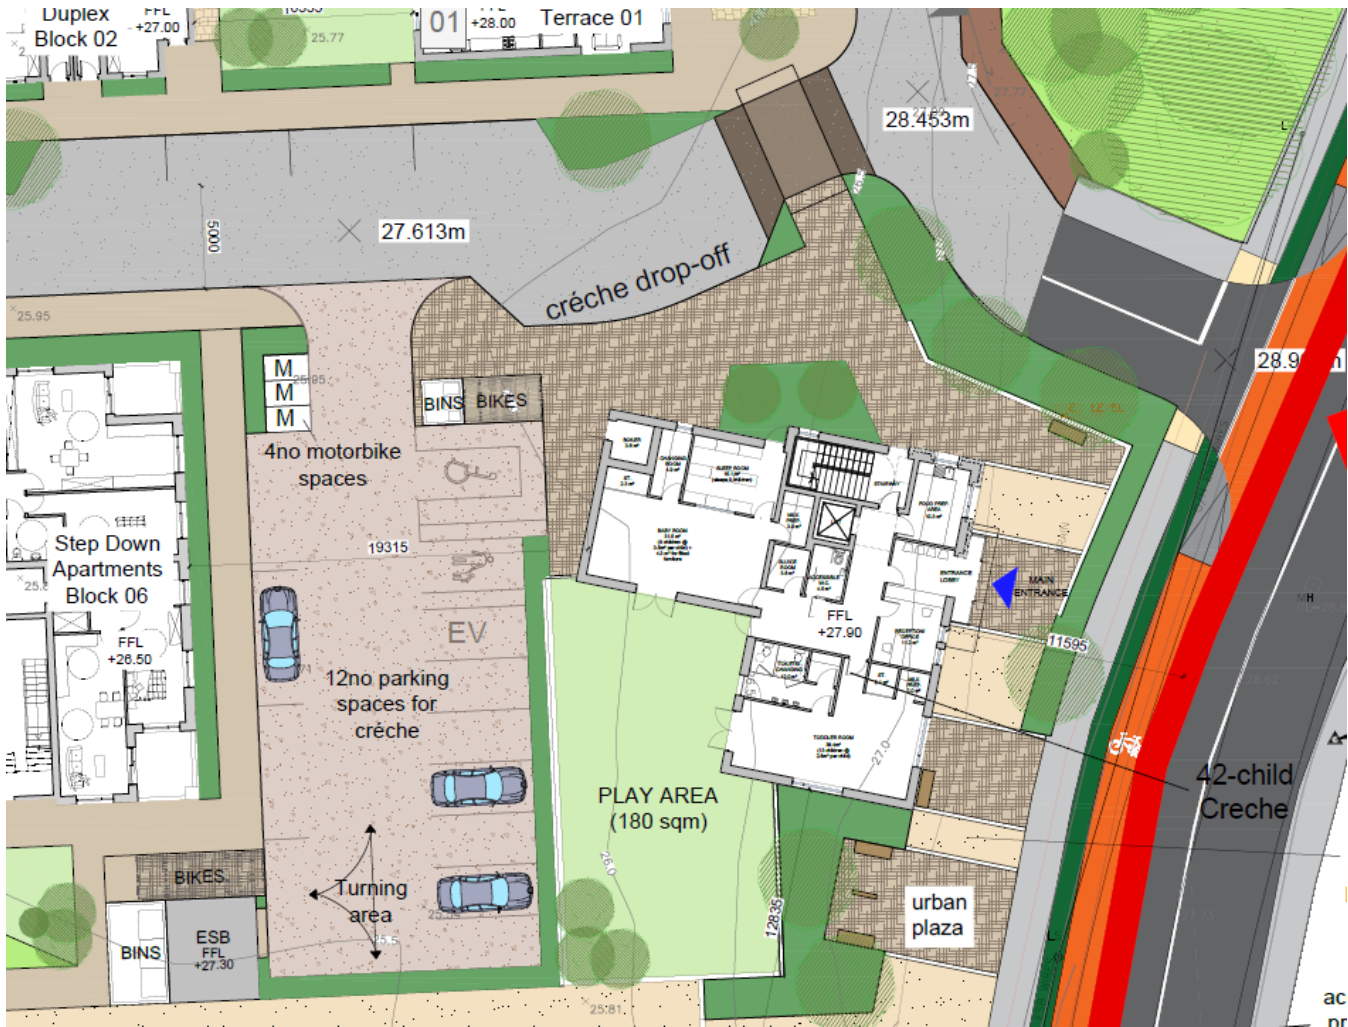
Creche Site Plan Extract – Drawing 20068/P/003D prepared by Deady Gahan Architects
